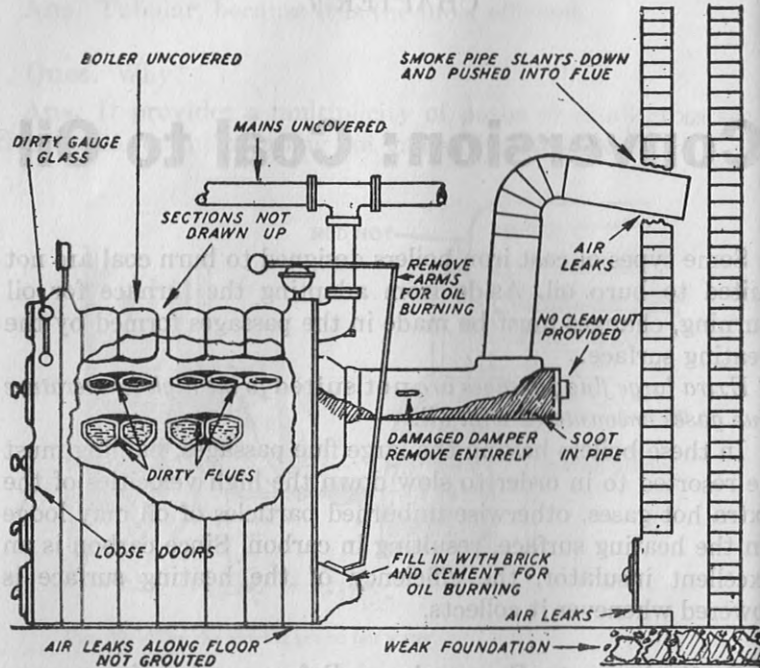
Boiler troubles to be remedied before converting and installing an oil burner.
